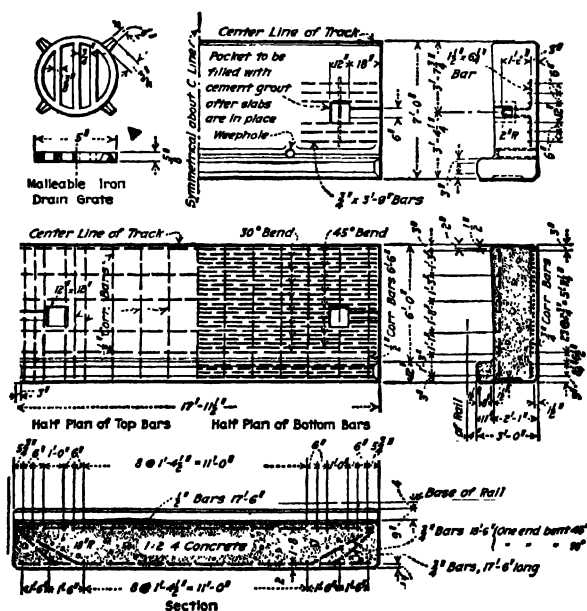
Standard slab for clear spans of 16 ft., Illinois Central R. R.
